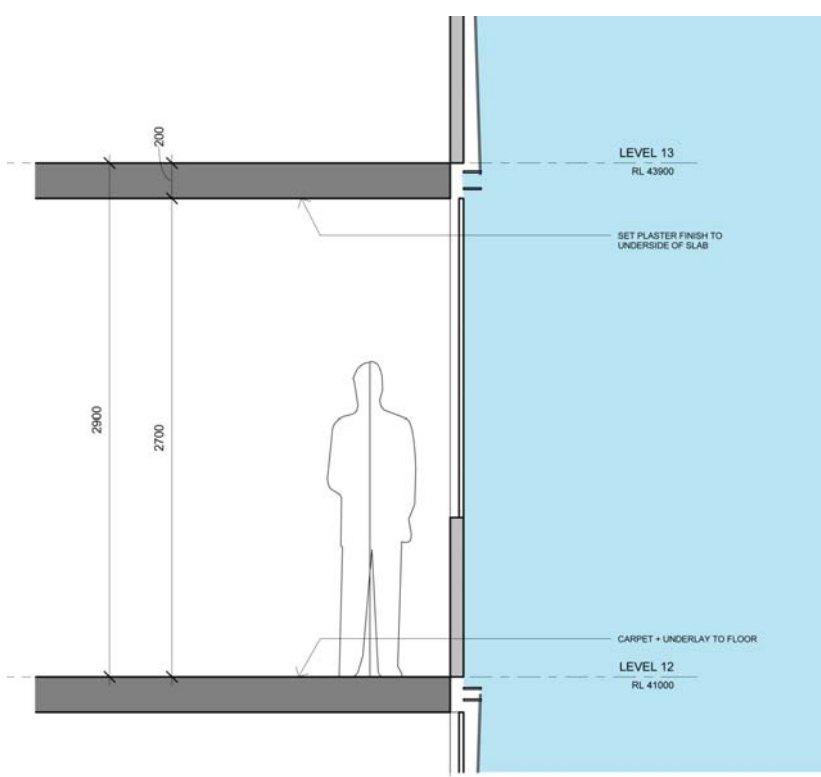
Floor to Floor Height Detail, W2 The Haymarket Student Accommodation
